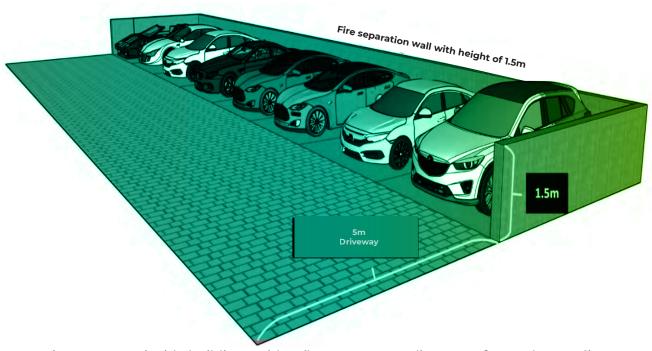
EVCB inside buildings with a floor area exceeding 216 m² must have a fire separation wall with a minimum height of 1.5 meters and at least 2 hours of fire resistance
